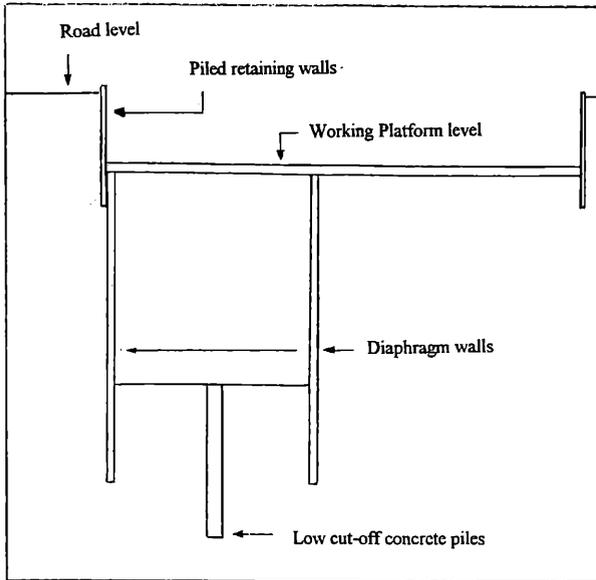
Westminster Station : working platform level and temporary piled retaining walls.
